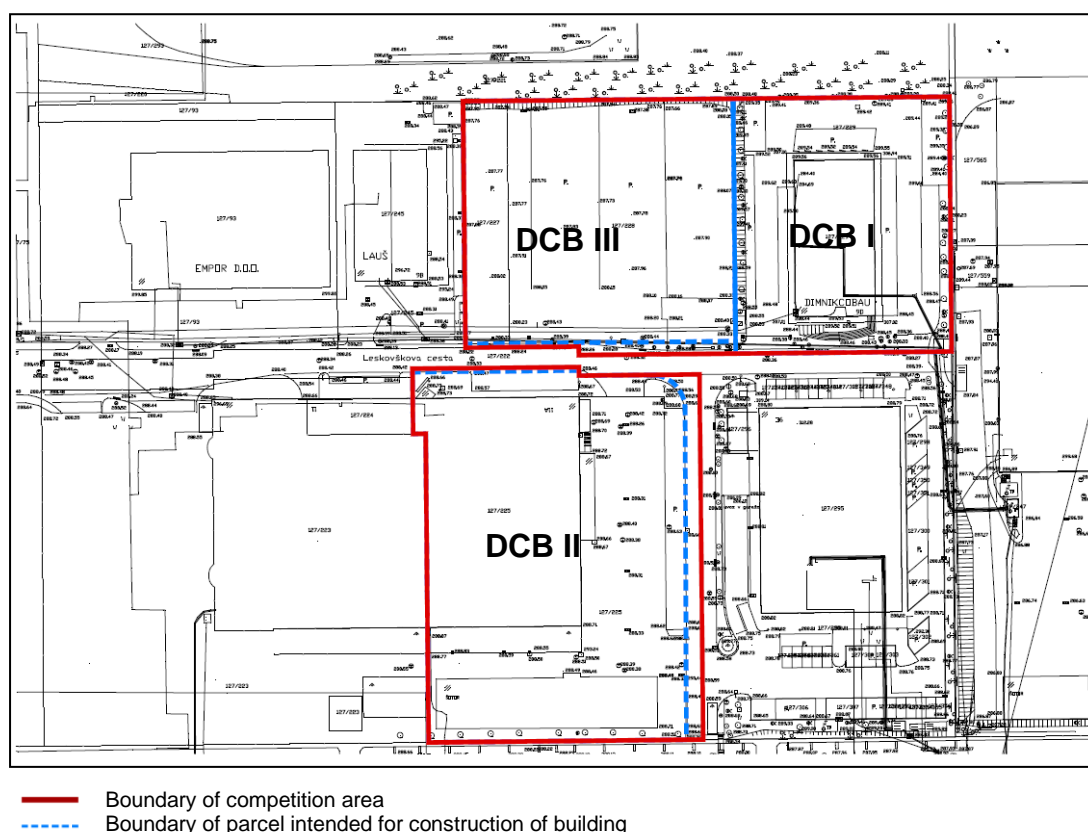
Survey plan of the site showing competition area and land plots intended for construction of DCB II and DCB III buildings
